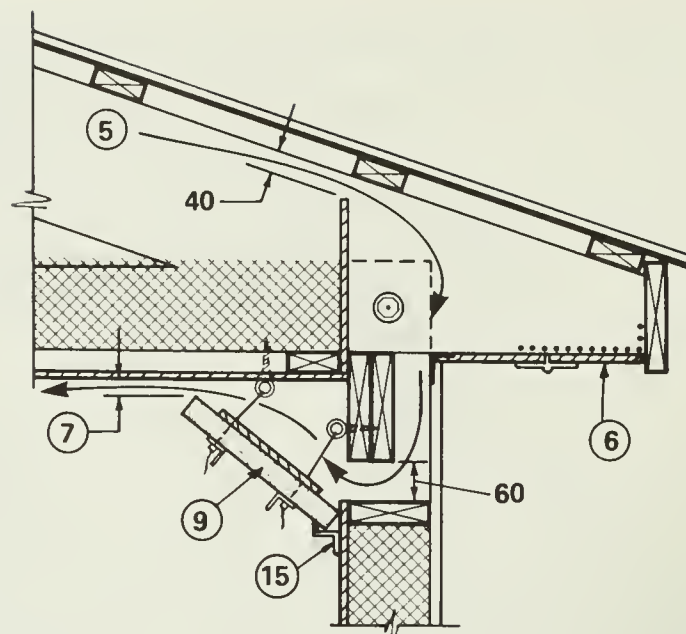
shows how to build an adjustable wall inlet. Rigid polystyrene foam insulation board is inexpensive
